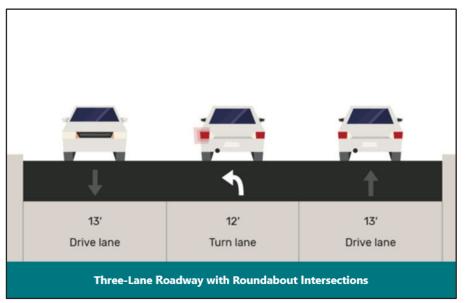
Three-Lane Section with Roundabouts – North of SE Leadbetter Road (RB2).
